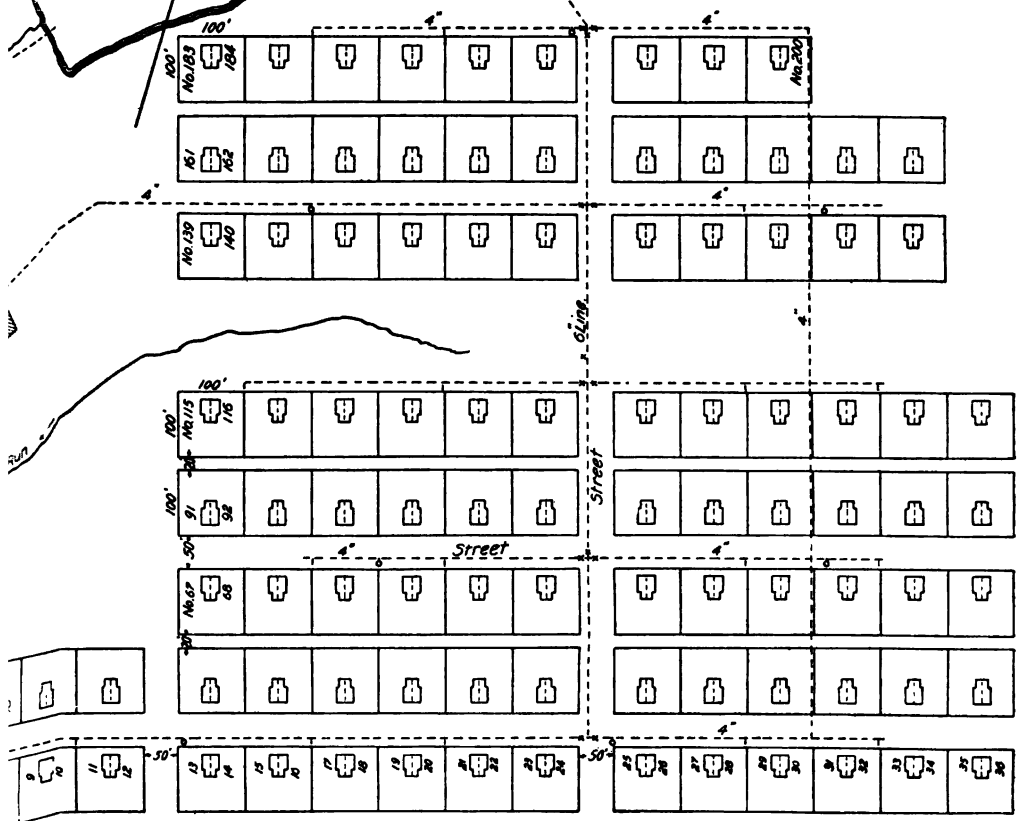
PLAN OF AMERICAN COAL AND COKE
